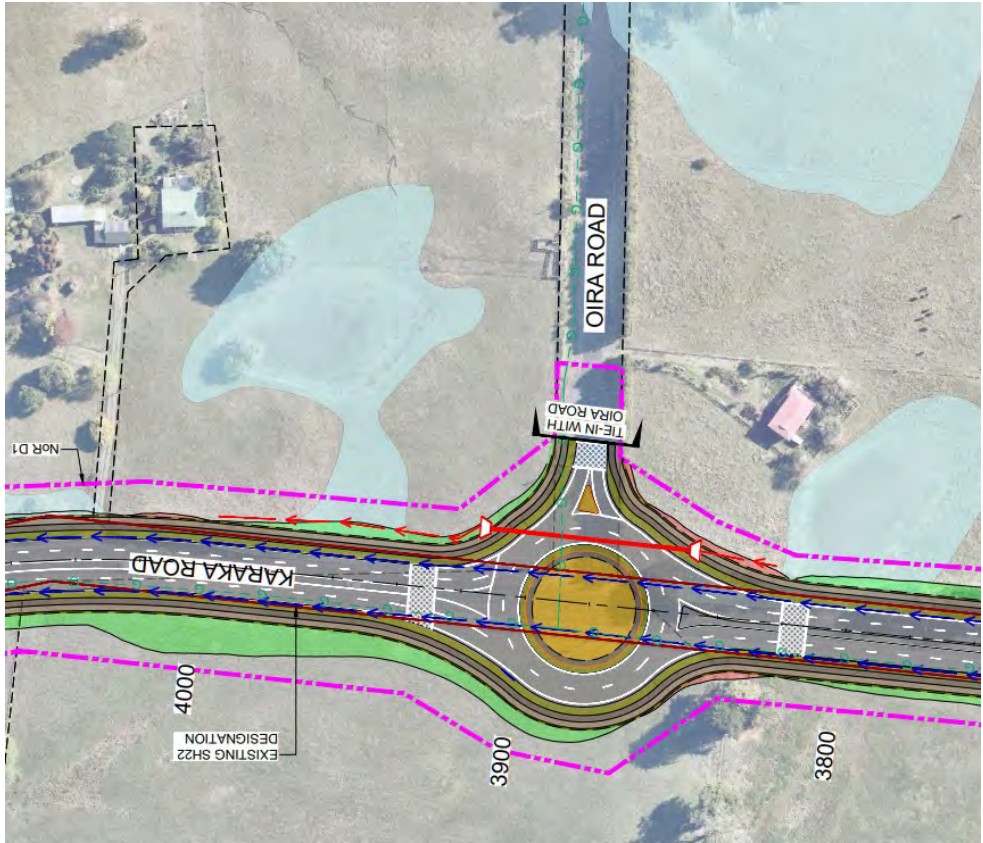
General arrangement plan – intersection of Oira Road/Karaka Road (SH22)
